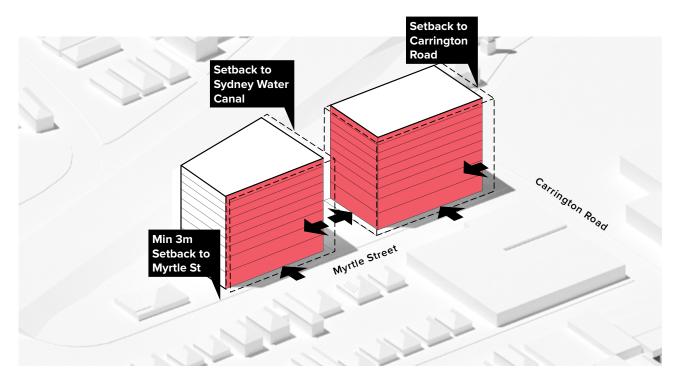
All Ground Floor Setbacks to be a minimum of 3m
